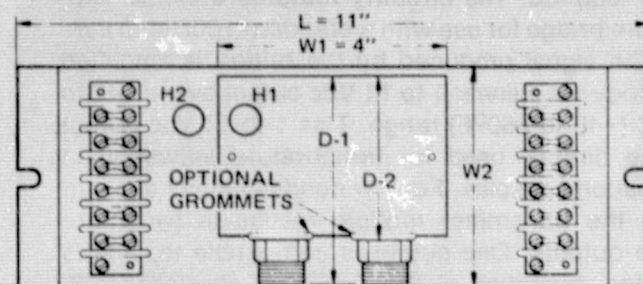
Panel Mounted Wiring Diagram w/Dimensions
